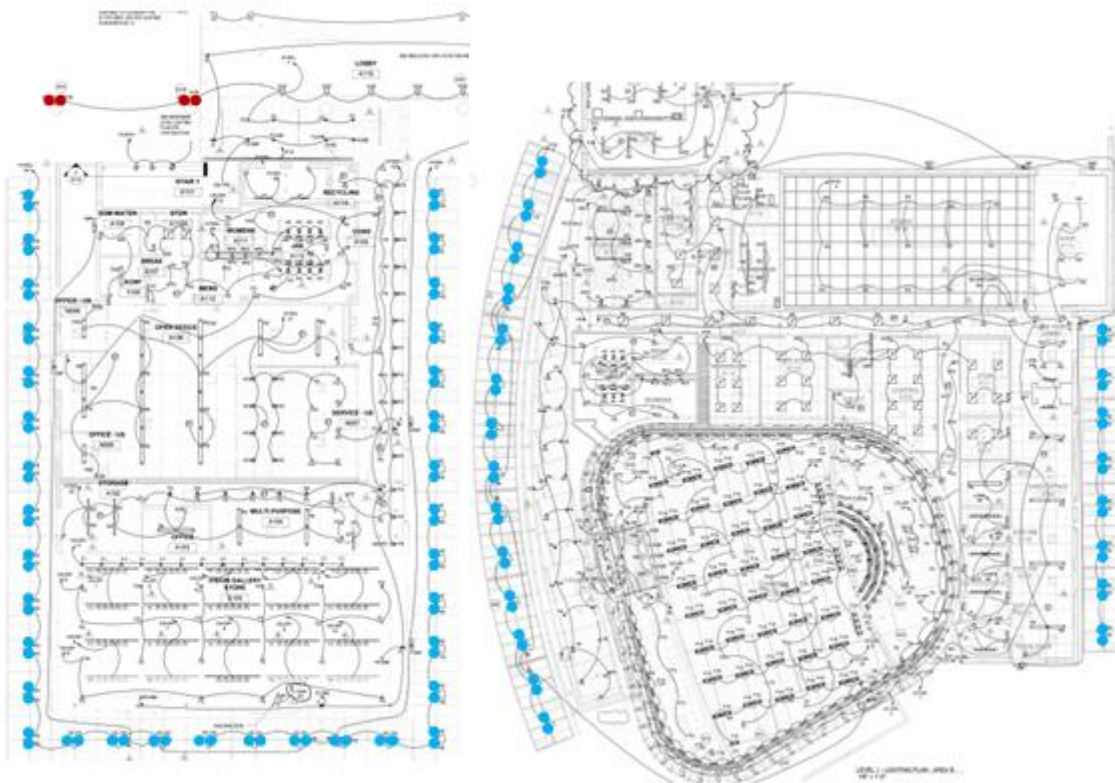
Level 1 Lighting Plan: Pedestrian Walkway Shade Canopy Lighting (NTS)
